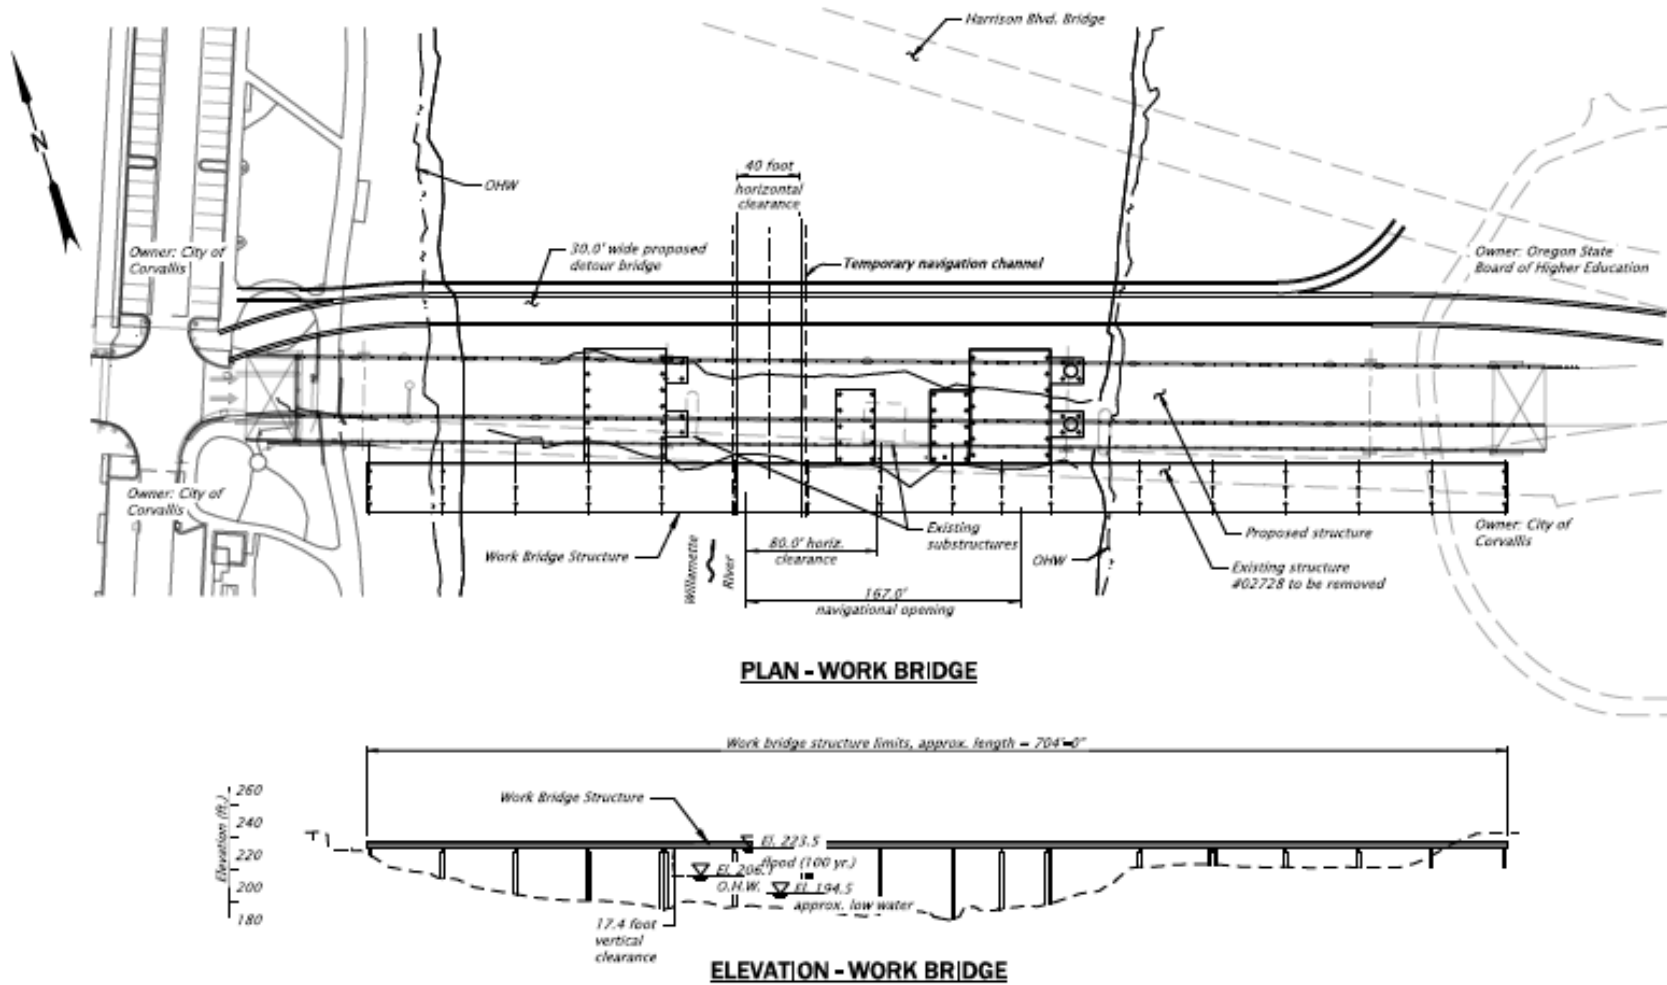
Plan and Elevation View of Conceptual Work Bridge
